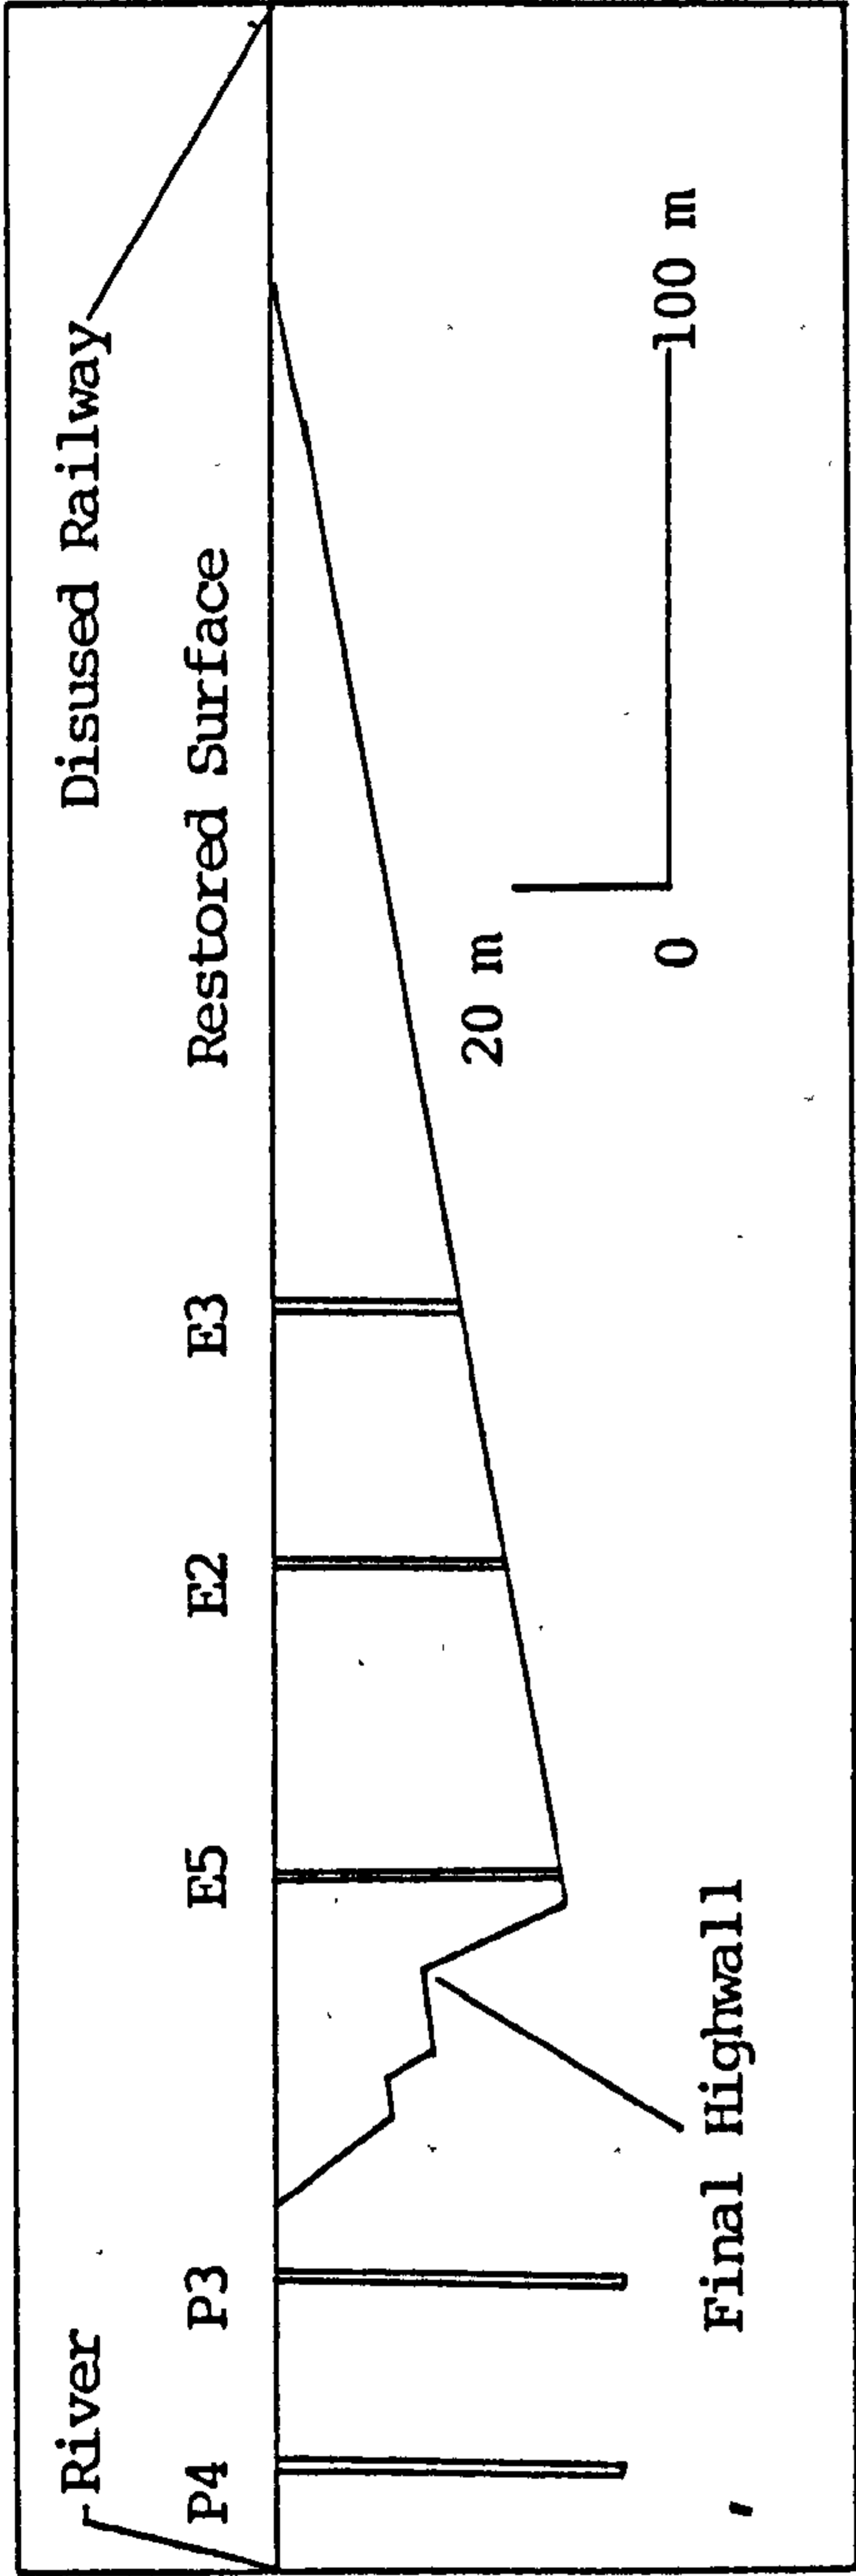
Instrumentation Scheme Section A-A, Site A.
